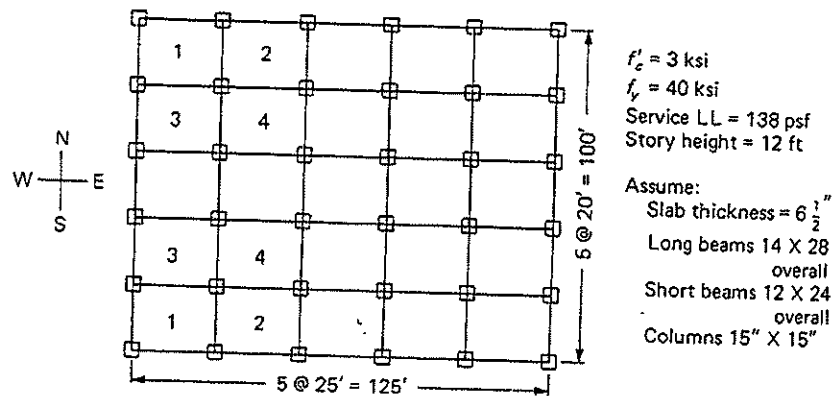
Floor plan in design example for two-way slab with beams.
